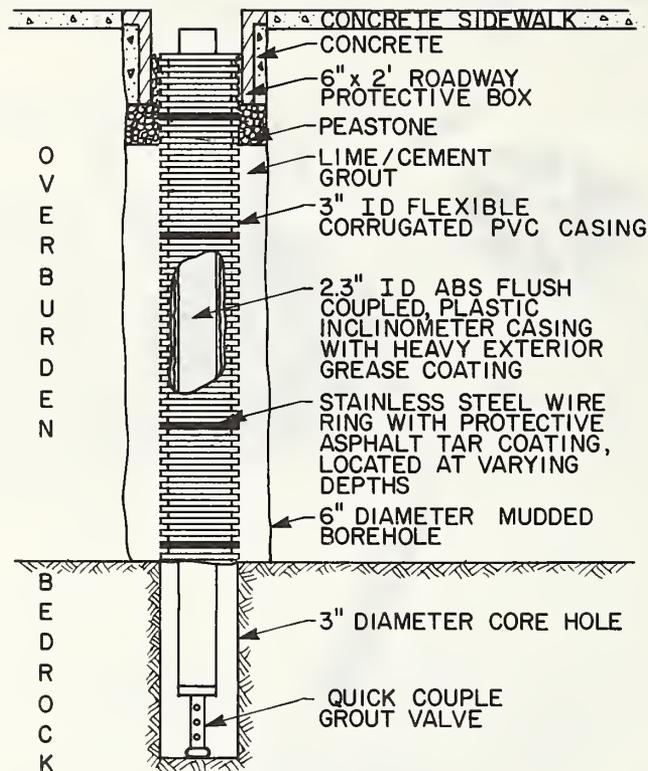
COMBINATION INCLINOMETER AND ELECTRICAL SETTLEMENT INSTALLATION
